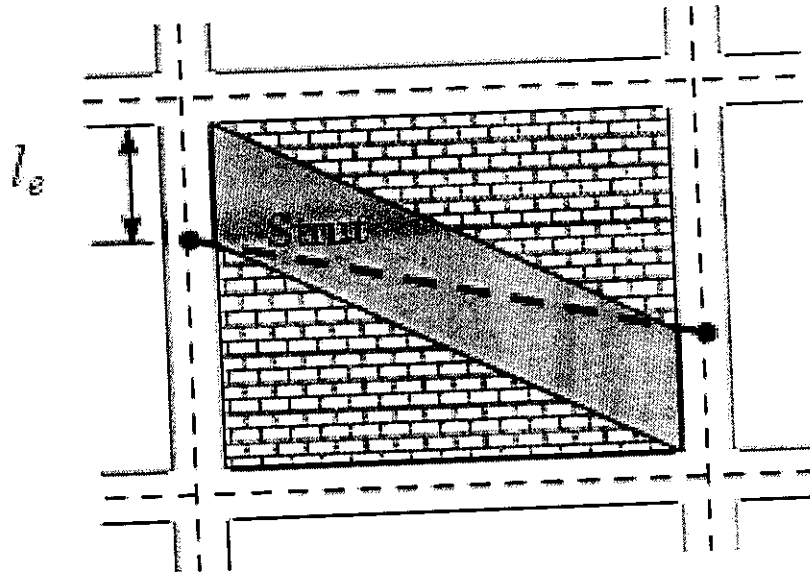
Position of eccentric strut (Al-Chaar, 2002)
